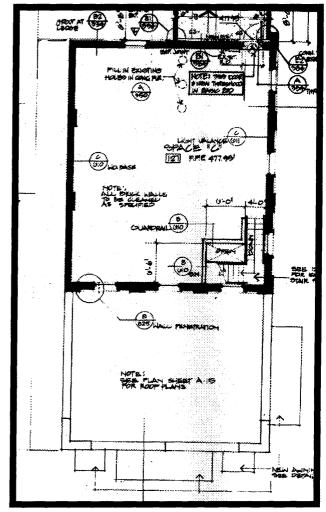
Second story substation interior. North is at the top of the figure. (Lutes/Sanetel/Architects 1980).
